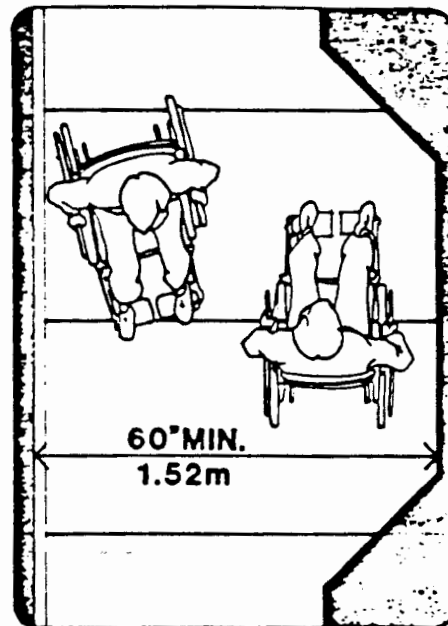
Passing area provided every 200 feet when minimum walkway width is used.
